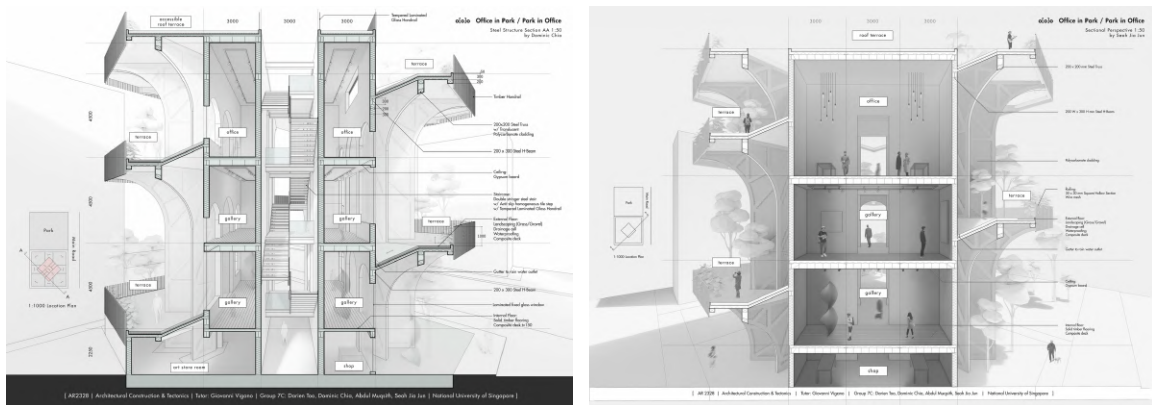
Section perspective drawings as 1/50 (steel frame structure - brace type)
